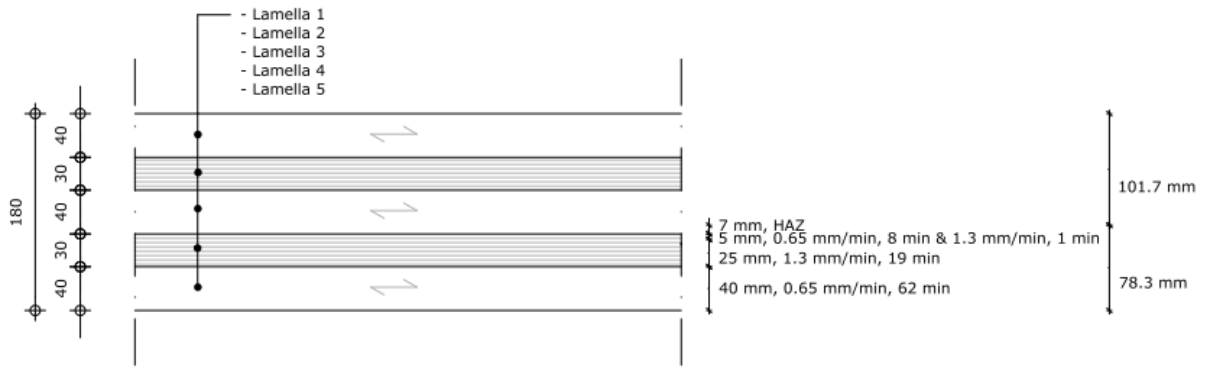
Charring thickness floor design 3 maximum cross-section in mm
